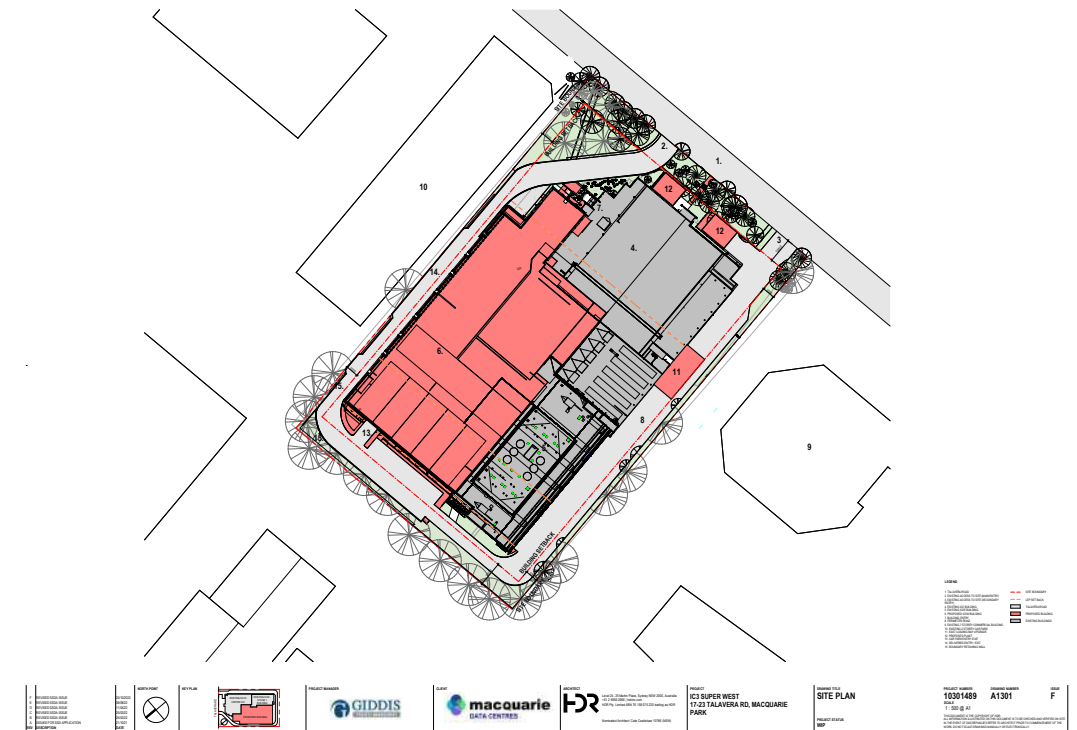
Proposed SSD IC3W - Site Plan (Source: HDR)
